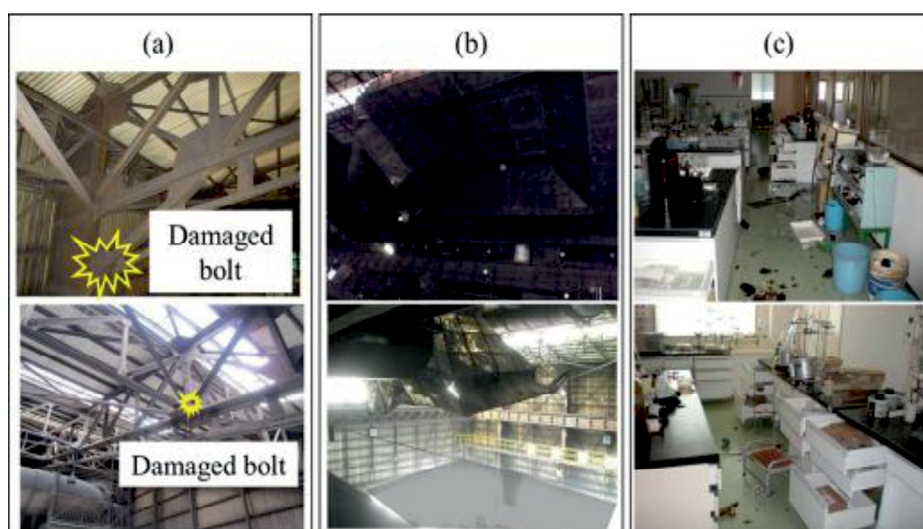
The damage of (a) KF-1 roof truss, (b) dust-catching hood, (c) analytical laboratory
